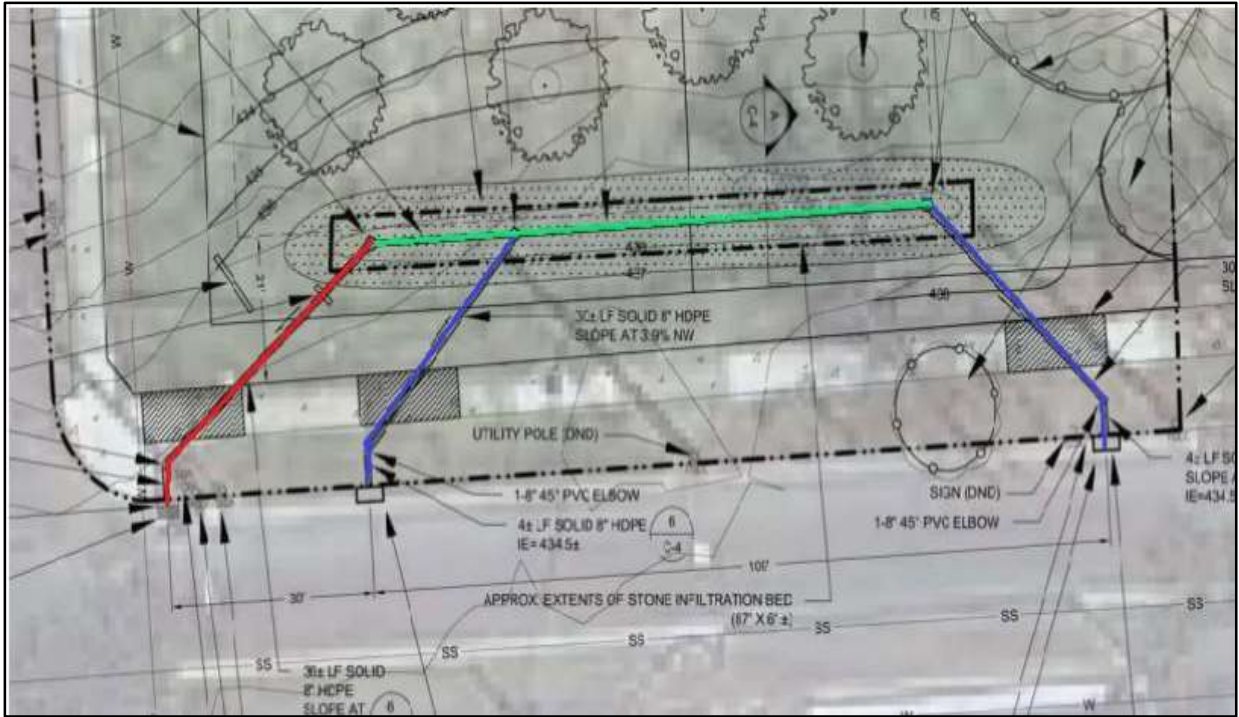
Plan View for 1344 W. Onondaga St. Rain Garden
